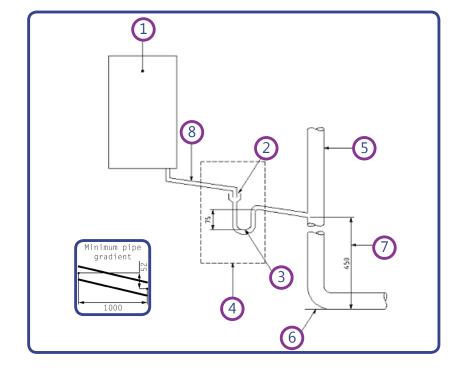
Connection of condensate discharge pipe to internal soil and vent stack. Note – Check manufacturer's instructions to see if an air break is required.
